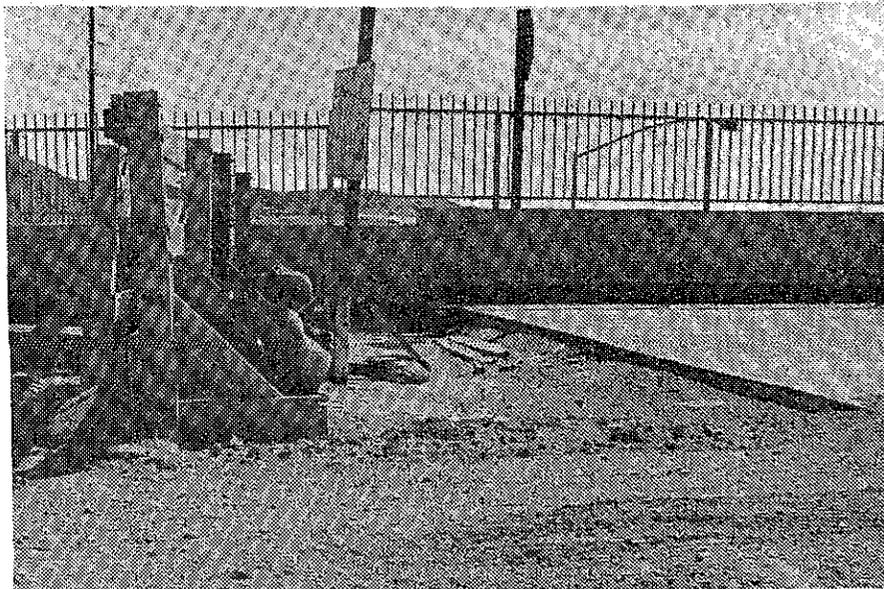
Approach and wingwall settlement at easterly end of Balboa Boulevard Overcrossing.
